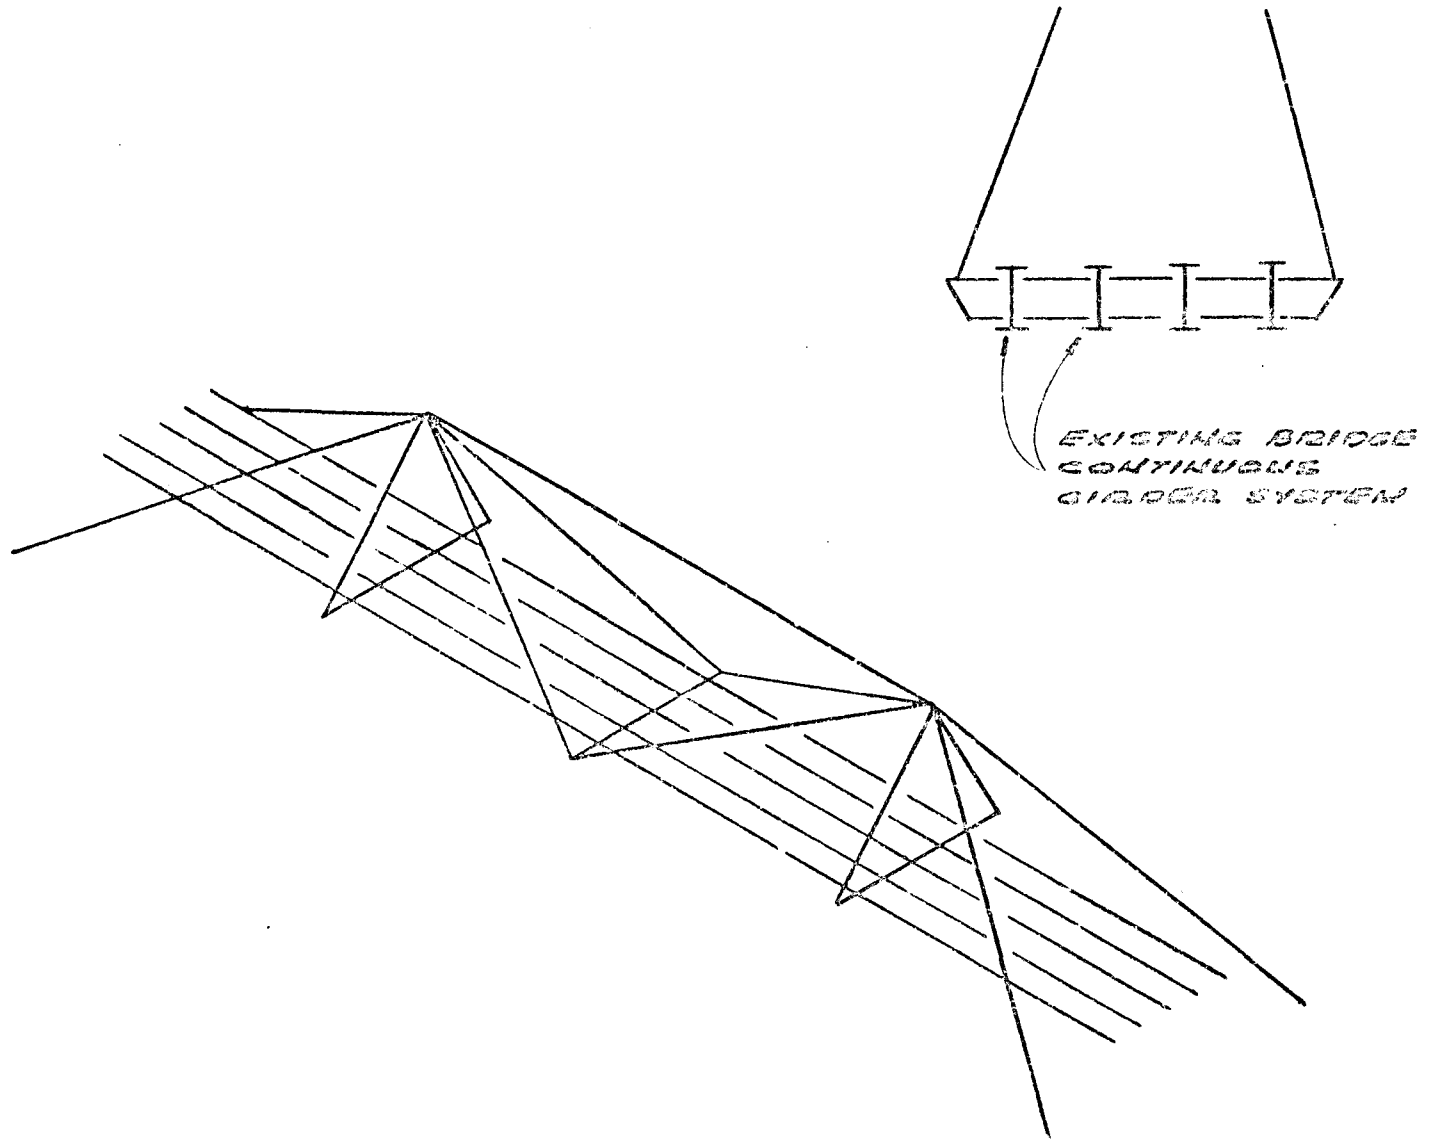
ISOMETRIC SCHEMATIC DRAWING OF FRAME BRIDGE CONCEPT IN MODIFIED BRIDGE APPLICATION
